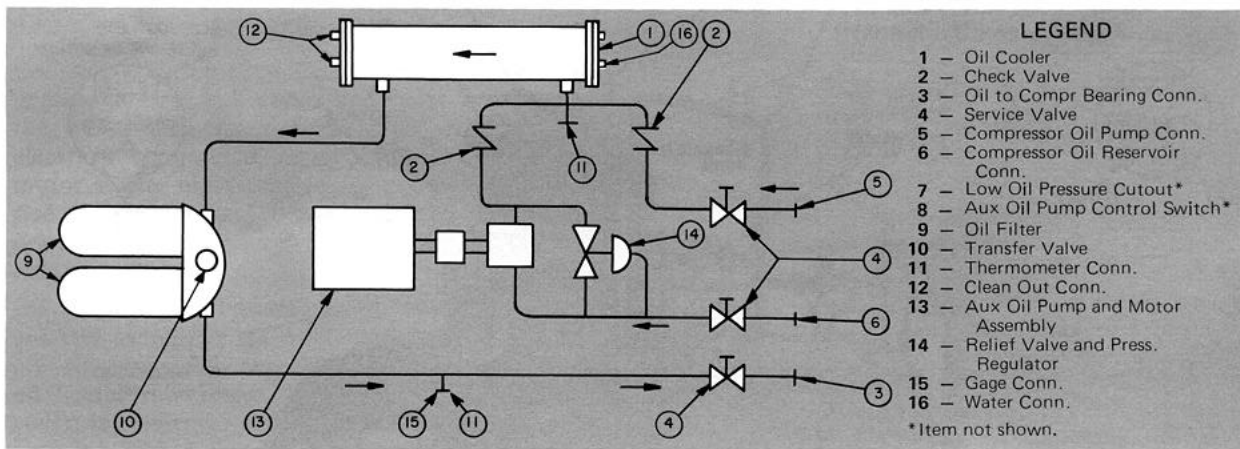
Single Cooler Auxiliary Oil Pump Piping Schematic
